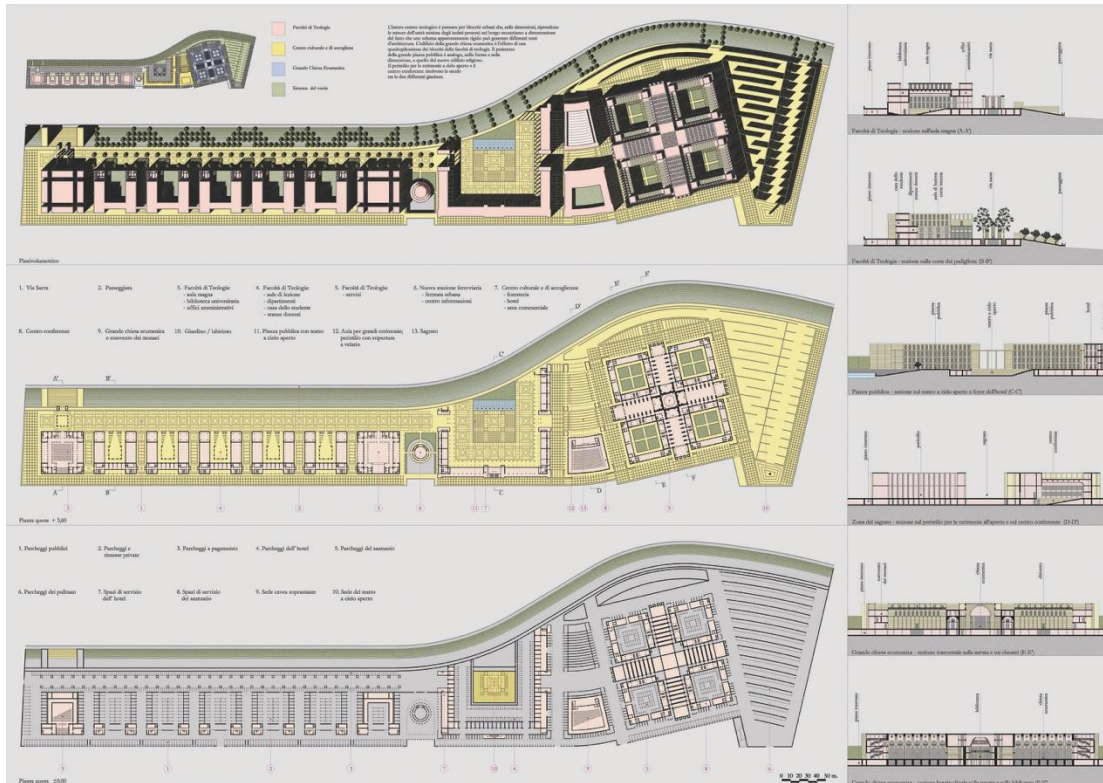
Author et al., *Fifth Bari*, From top to bottom: mass plan, first floor plan, ground floor plan
